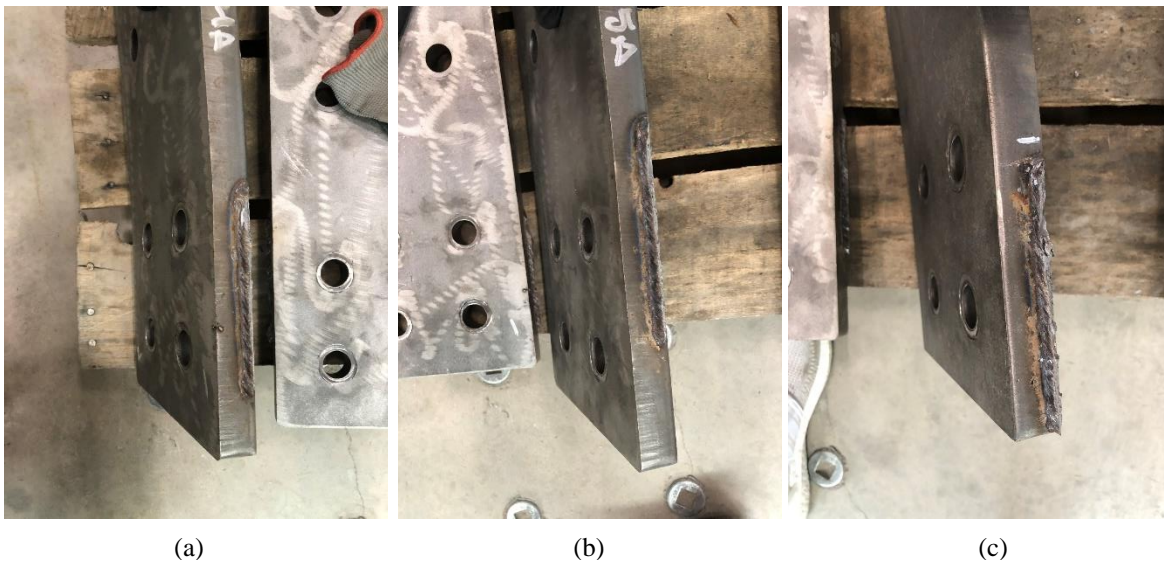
Location of weld on Test Specimen (a) About bolt Center of Gravity (Test 4) (b) Above bolt Center of Gravity (Test 5) (c) Below Bolt Center of Gravity (Test 6)
